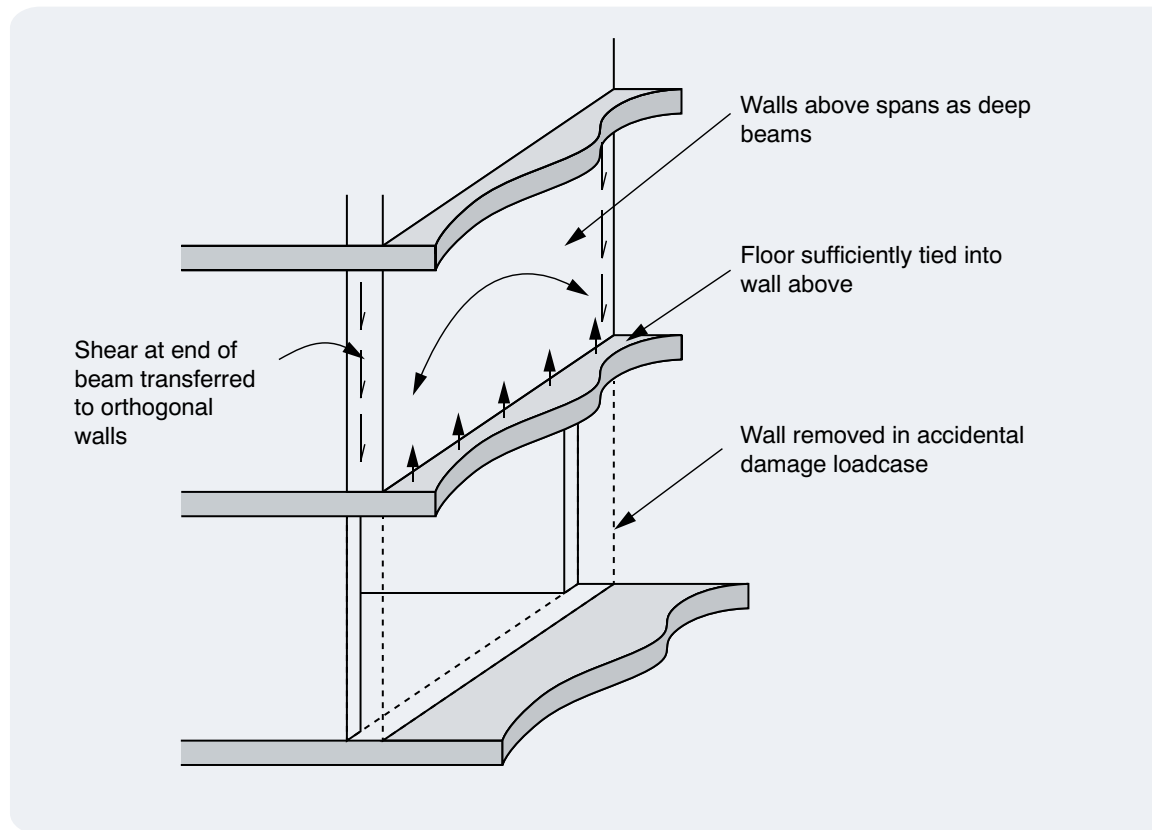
Precast core walls spanning as deep beams in accidental damage situation.
